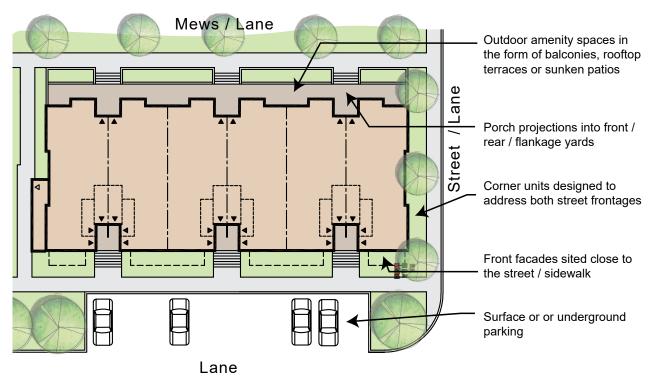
Conceptual Demonstration Site Plan For Stacked Townhouses With Underground Parking
